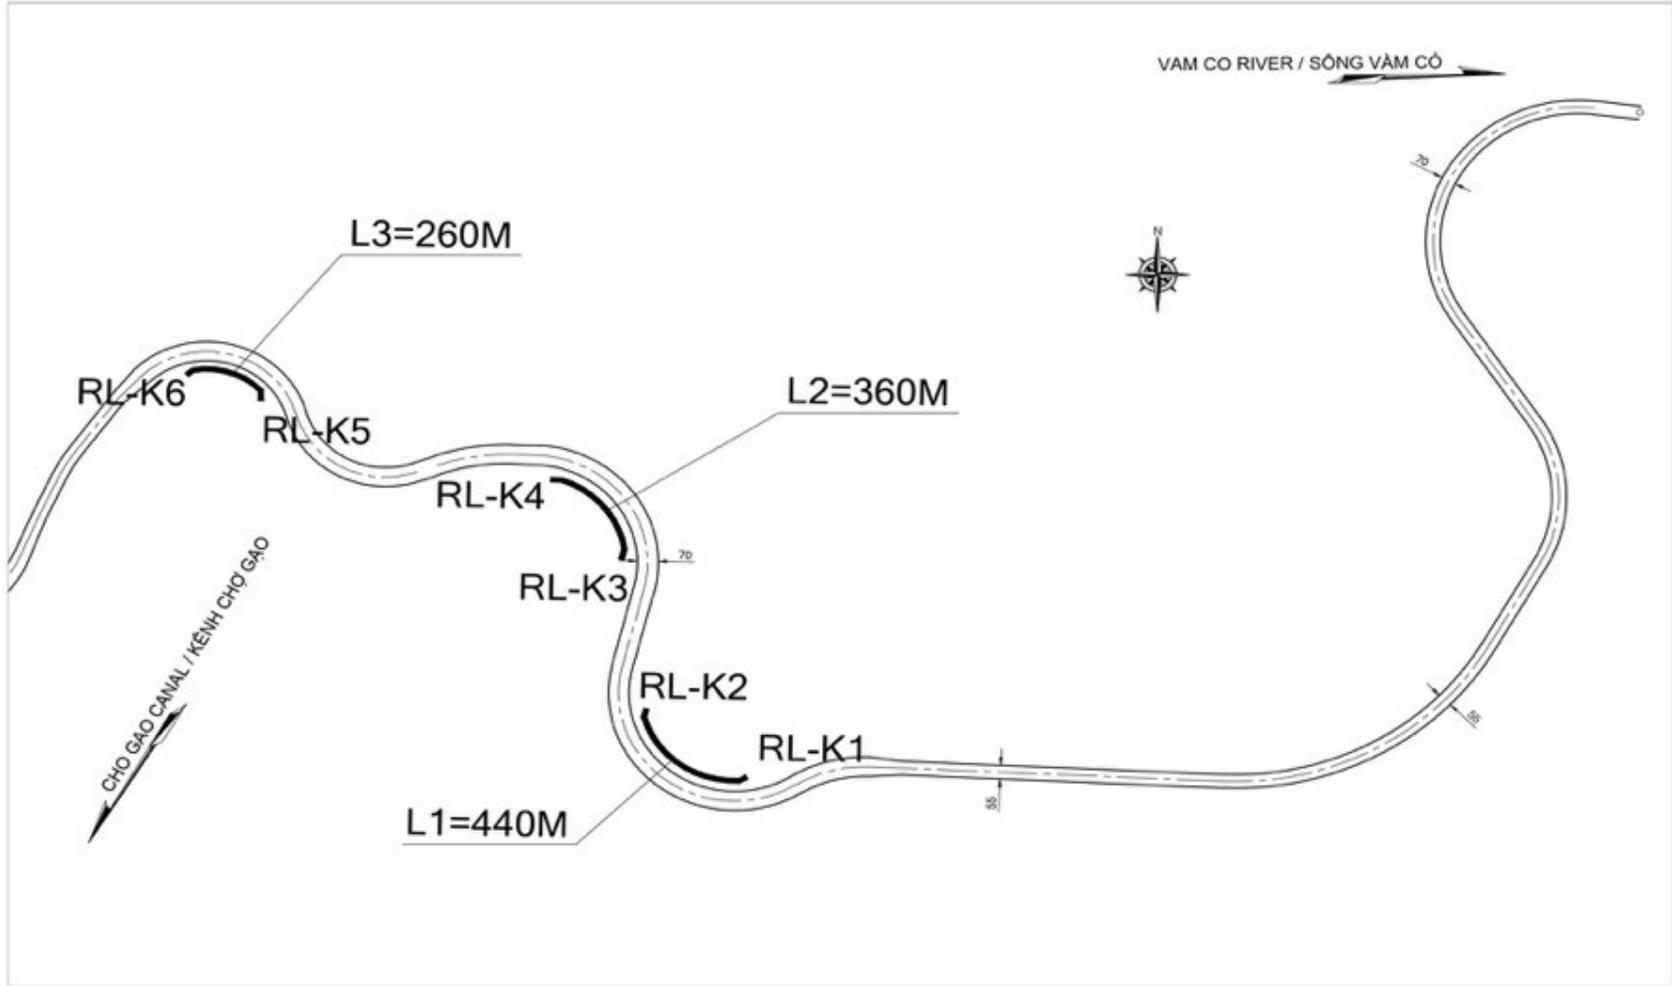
Proposed embankment for Rach La canal (East-West Corridor)
